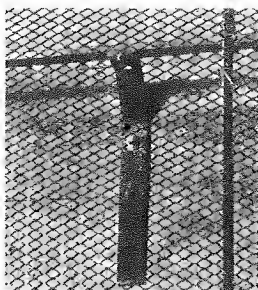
Bent Strap Iron Brace and Anchor for Horizontal Furring Stiffener.
